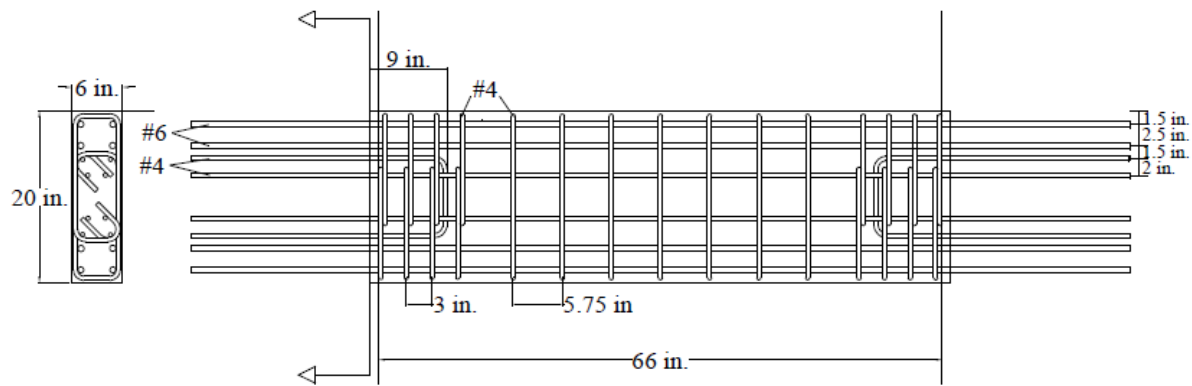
Reinforcement detailing for CB-5 (adapted from Setkit, 2012)
